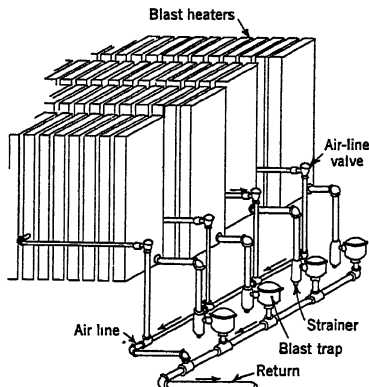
TYPICAL CONNECTIONS TO CENTRAL FAN SYSTEM HEATING UNITS EXCEEDING 12 SECTIONS
